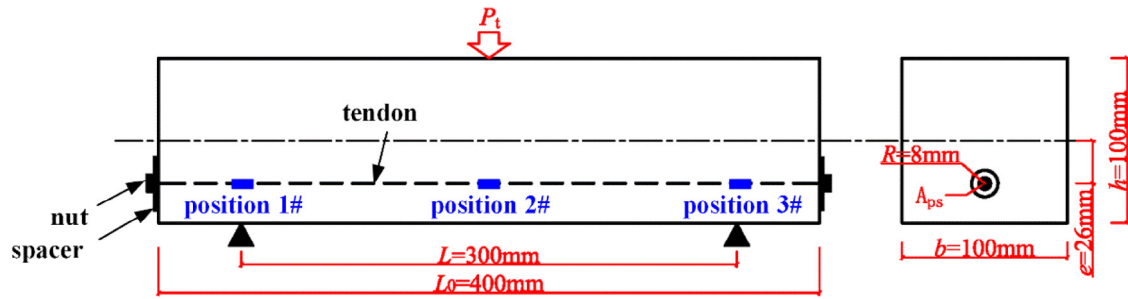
Dimensions of the prestressed concrete beam specimen.
